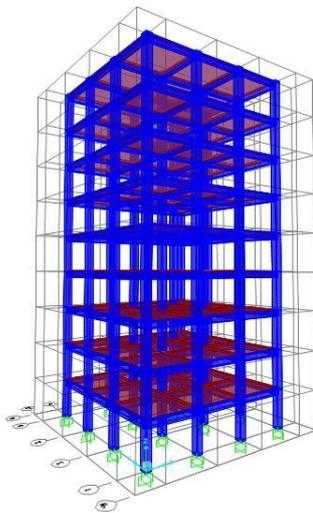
FEM model of Seven Storey Building with Fixed Based Condition
